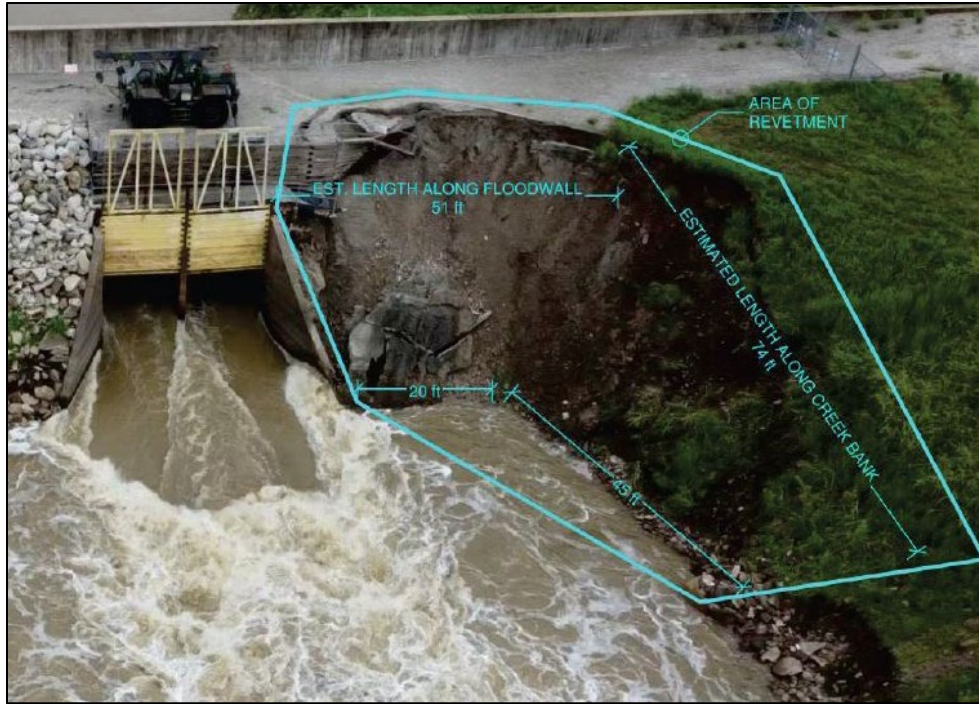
Photo of damages to the water control structure and the adjacent embankment and levee.
